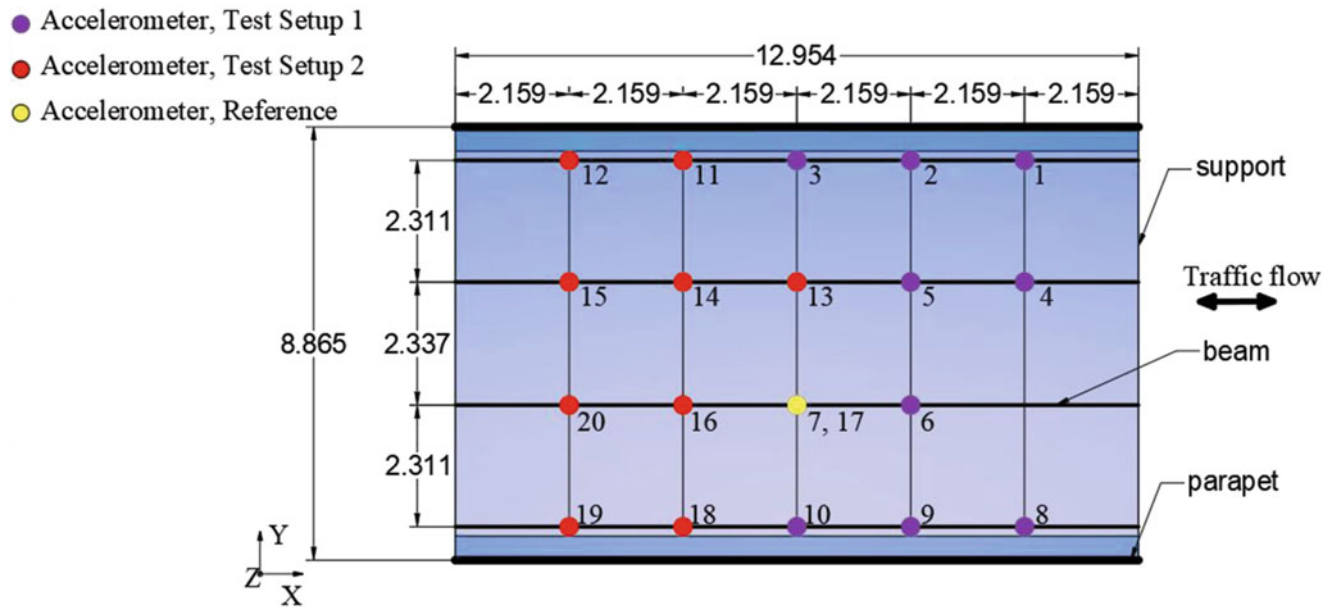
Sensor instrumentation plan for one of the bridge span with two setups (all dimensions are in meters)
